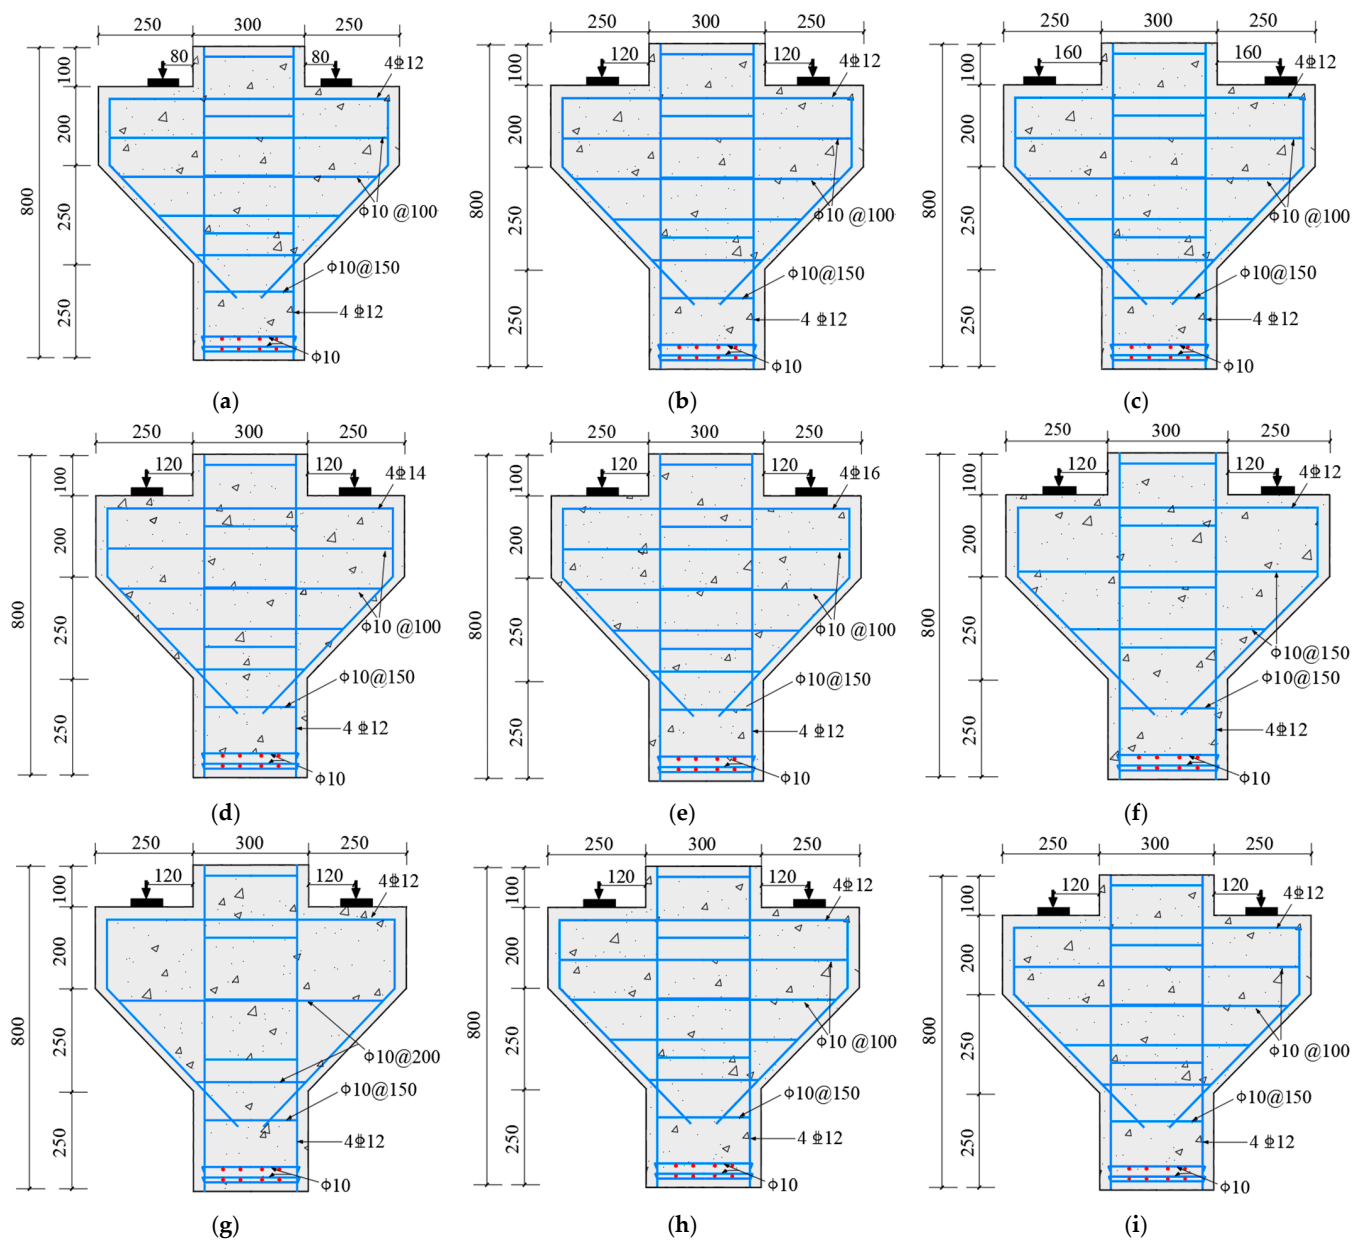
Specimens' dimension and reinforcement arrangement: (a) MC01 specimen; (b) MC02 specimen; (c) MC03 specimen; (d) MC04 specimen; (e) MC05 specimen; (f) MC06 specimen; (g) MC07 specimen; (h) MC08 specimen; (i) MC09 specimen.
